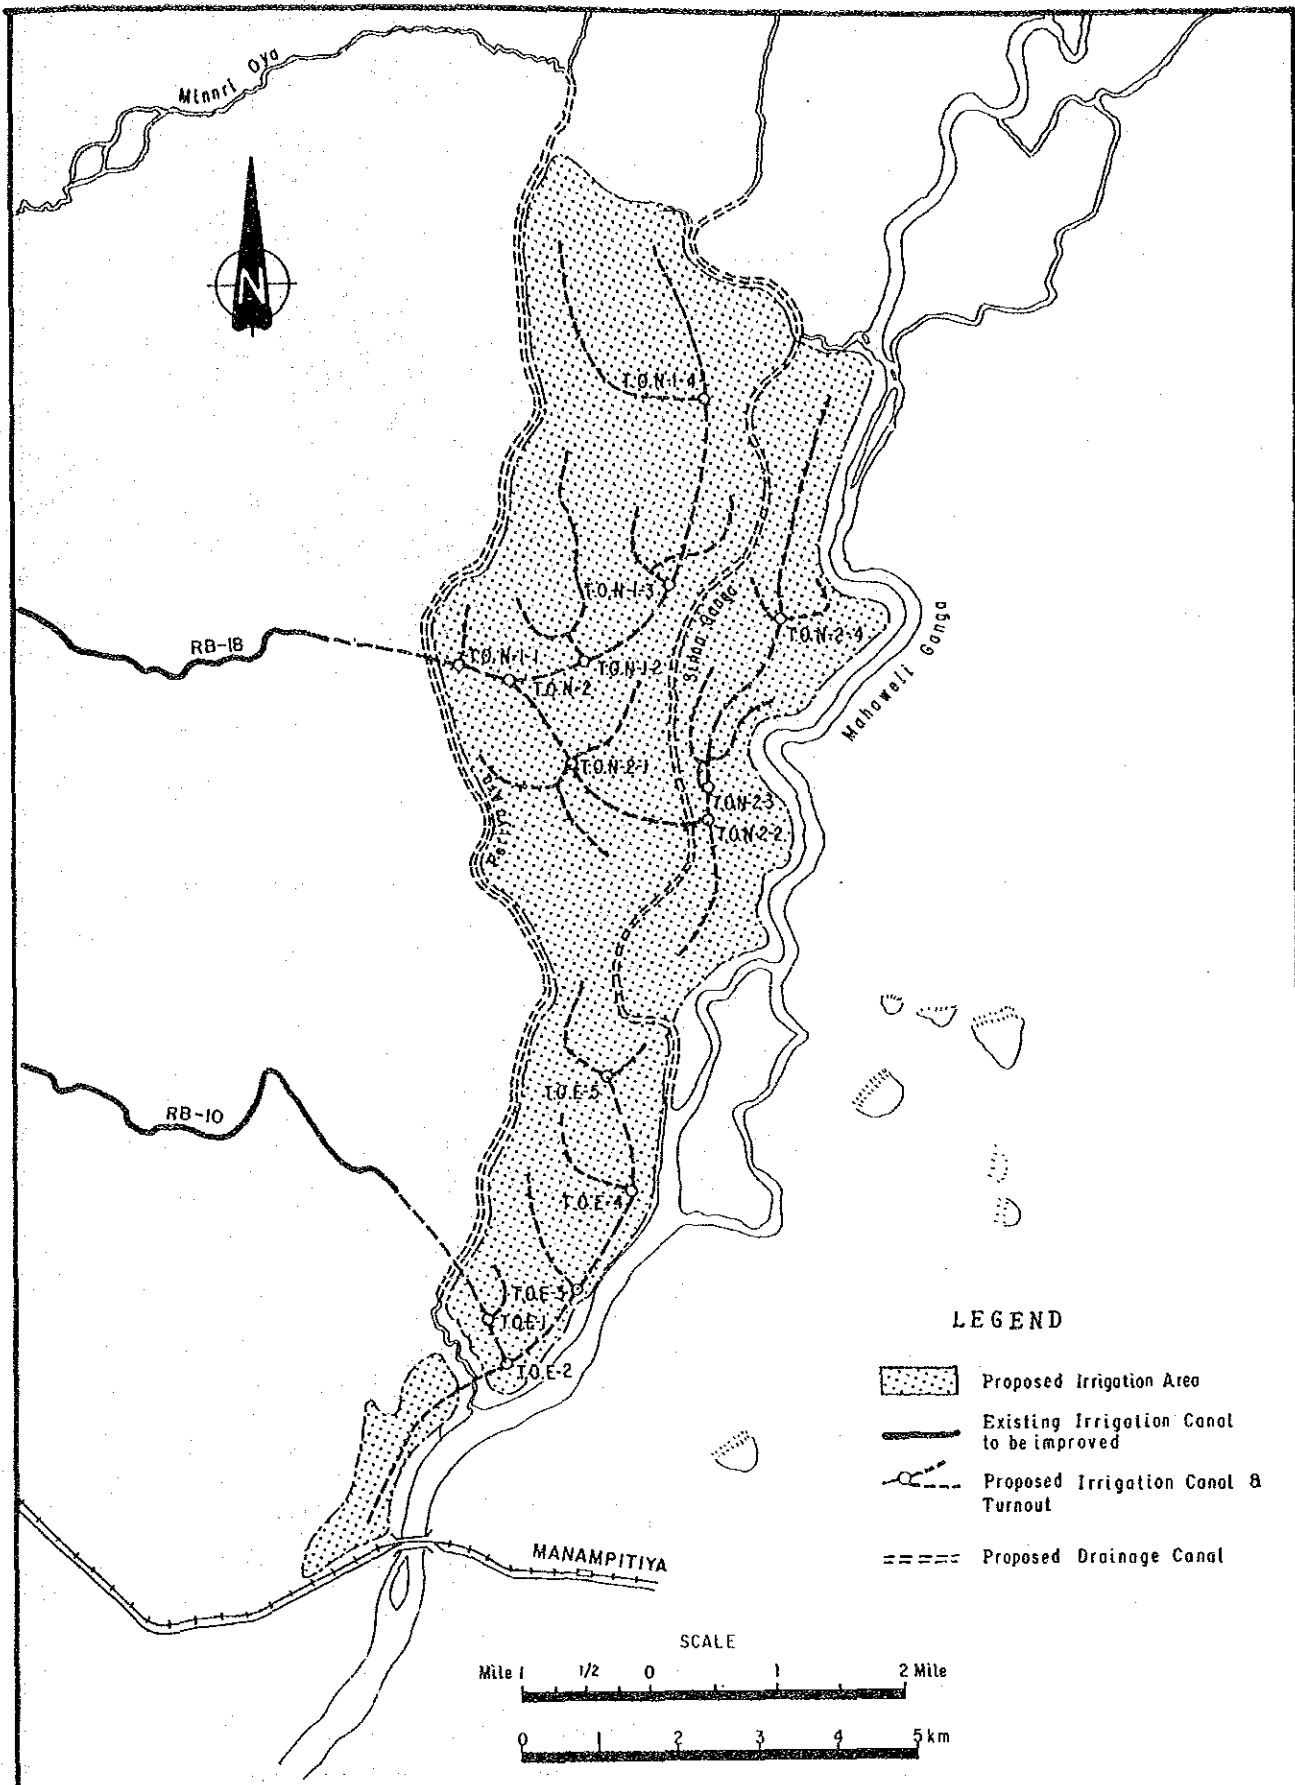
(2/3) Irrigation and Drainage Layout (System D2)
